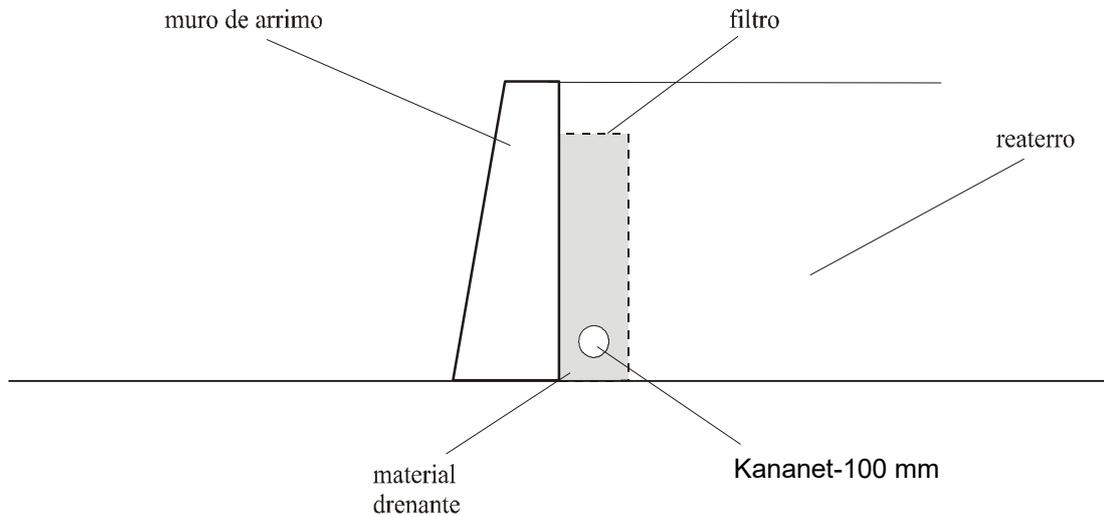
Intercepting drainage curtain, behind the retaining wall
